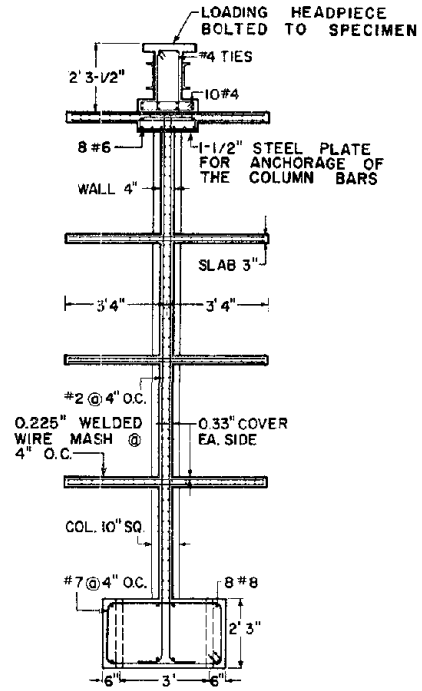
DIMENSIONS AND DETAILING OF THE MODEL SUB-ASSEMBLY, SIDE ELEVATION
